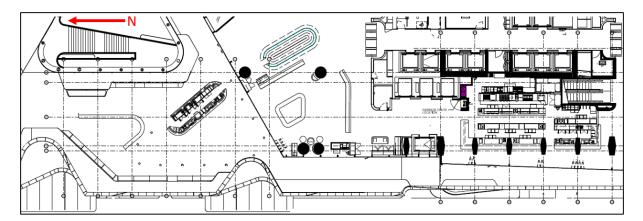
Proposed floorplans, including new southern kitchen, internal seating and fixtures, and bar area on northern terrace
